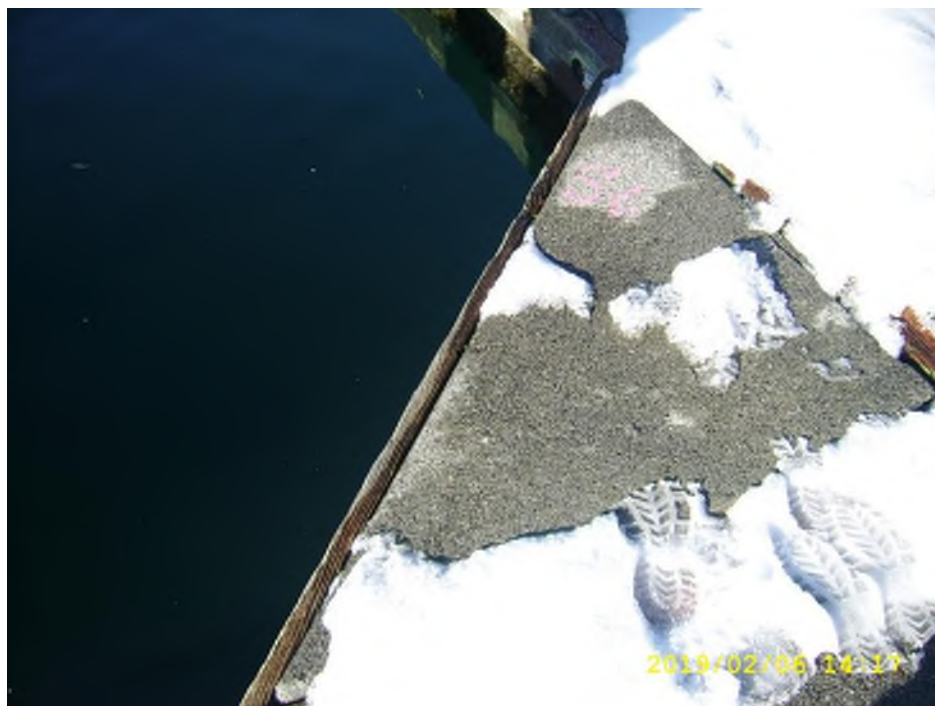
Float C/D – Typical Damaged Concrete Tri-Frame
